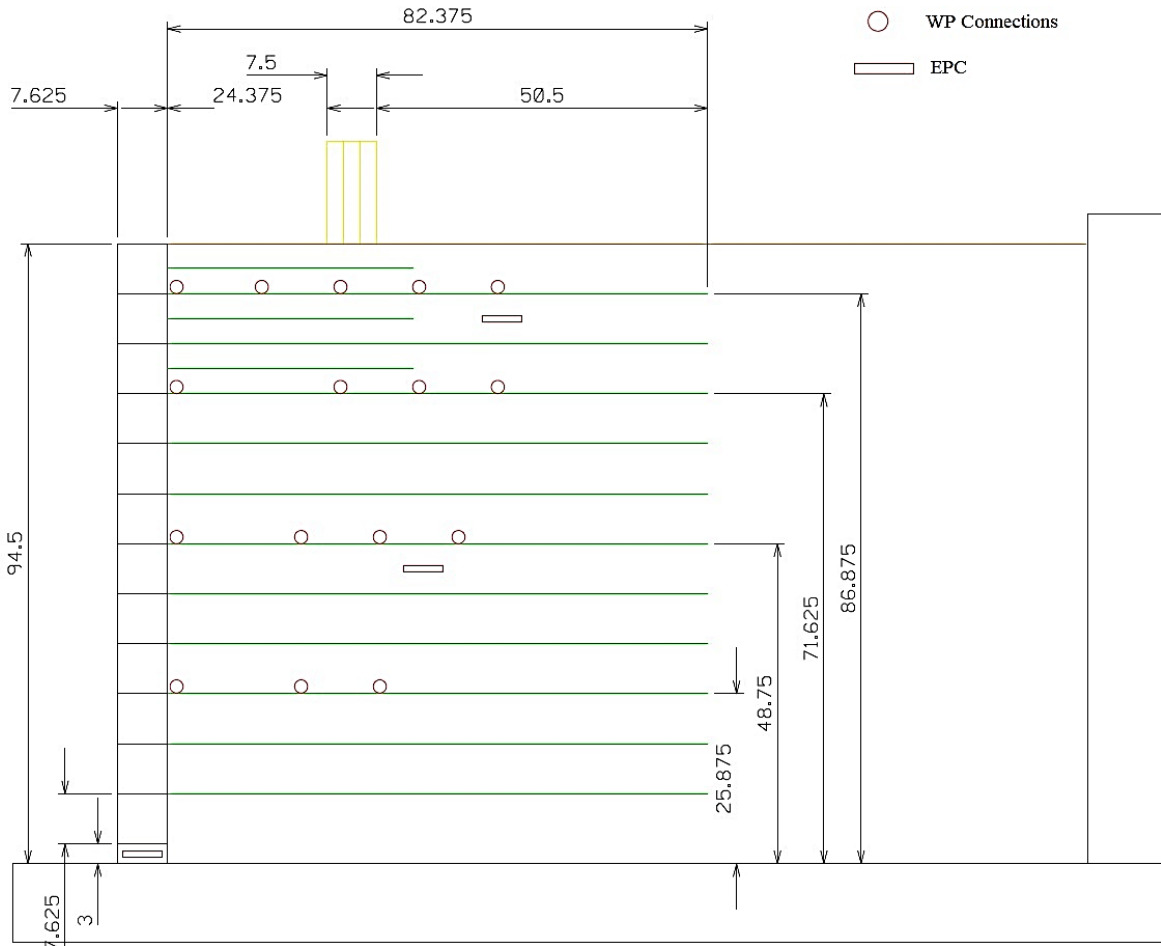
Schematic instrumentation layout for GRS Abutment Model #1 (CMU block facing with 8-inch reinforcement spacing; Dimensions are in inches)
